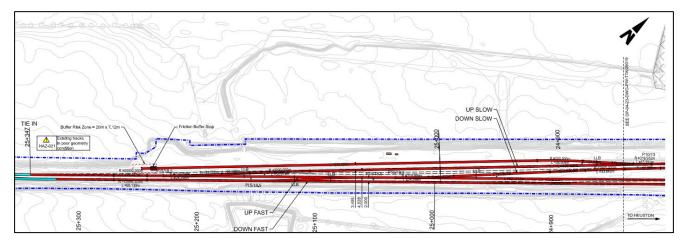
Hazelhatch & Celbridge Station – Track Plan Layout (1 of 3)
